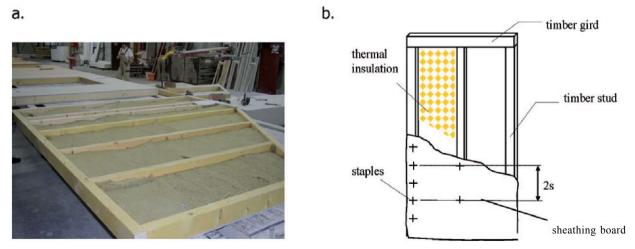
Composition of a timber-frame wall element; a.) macro-panel system, b.) single wall element
